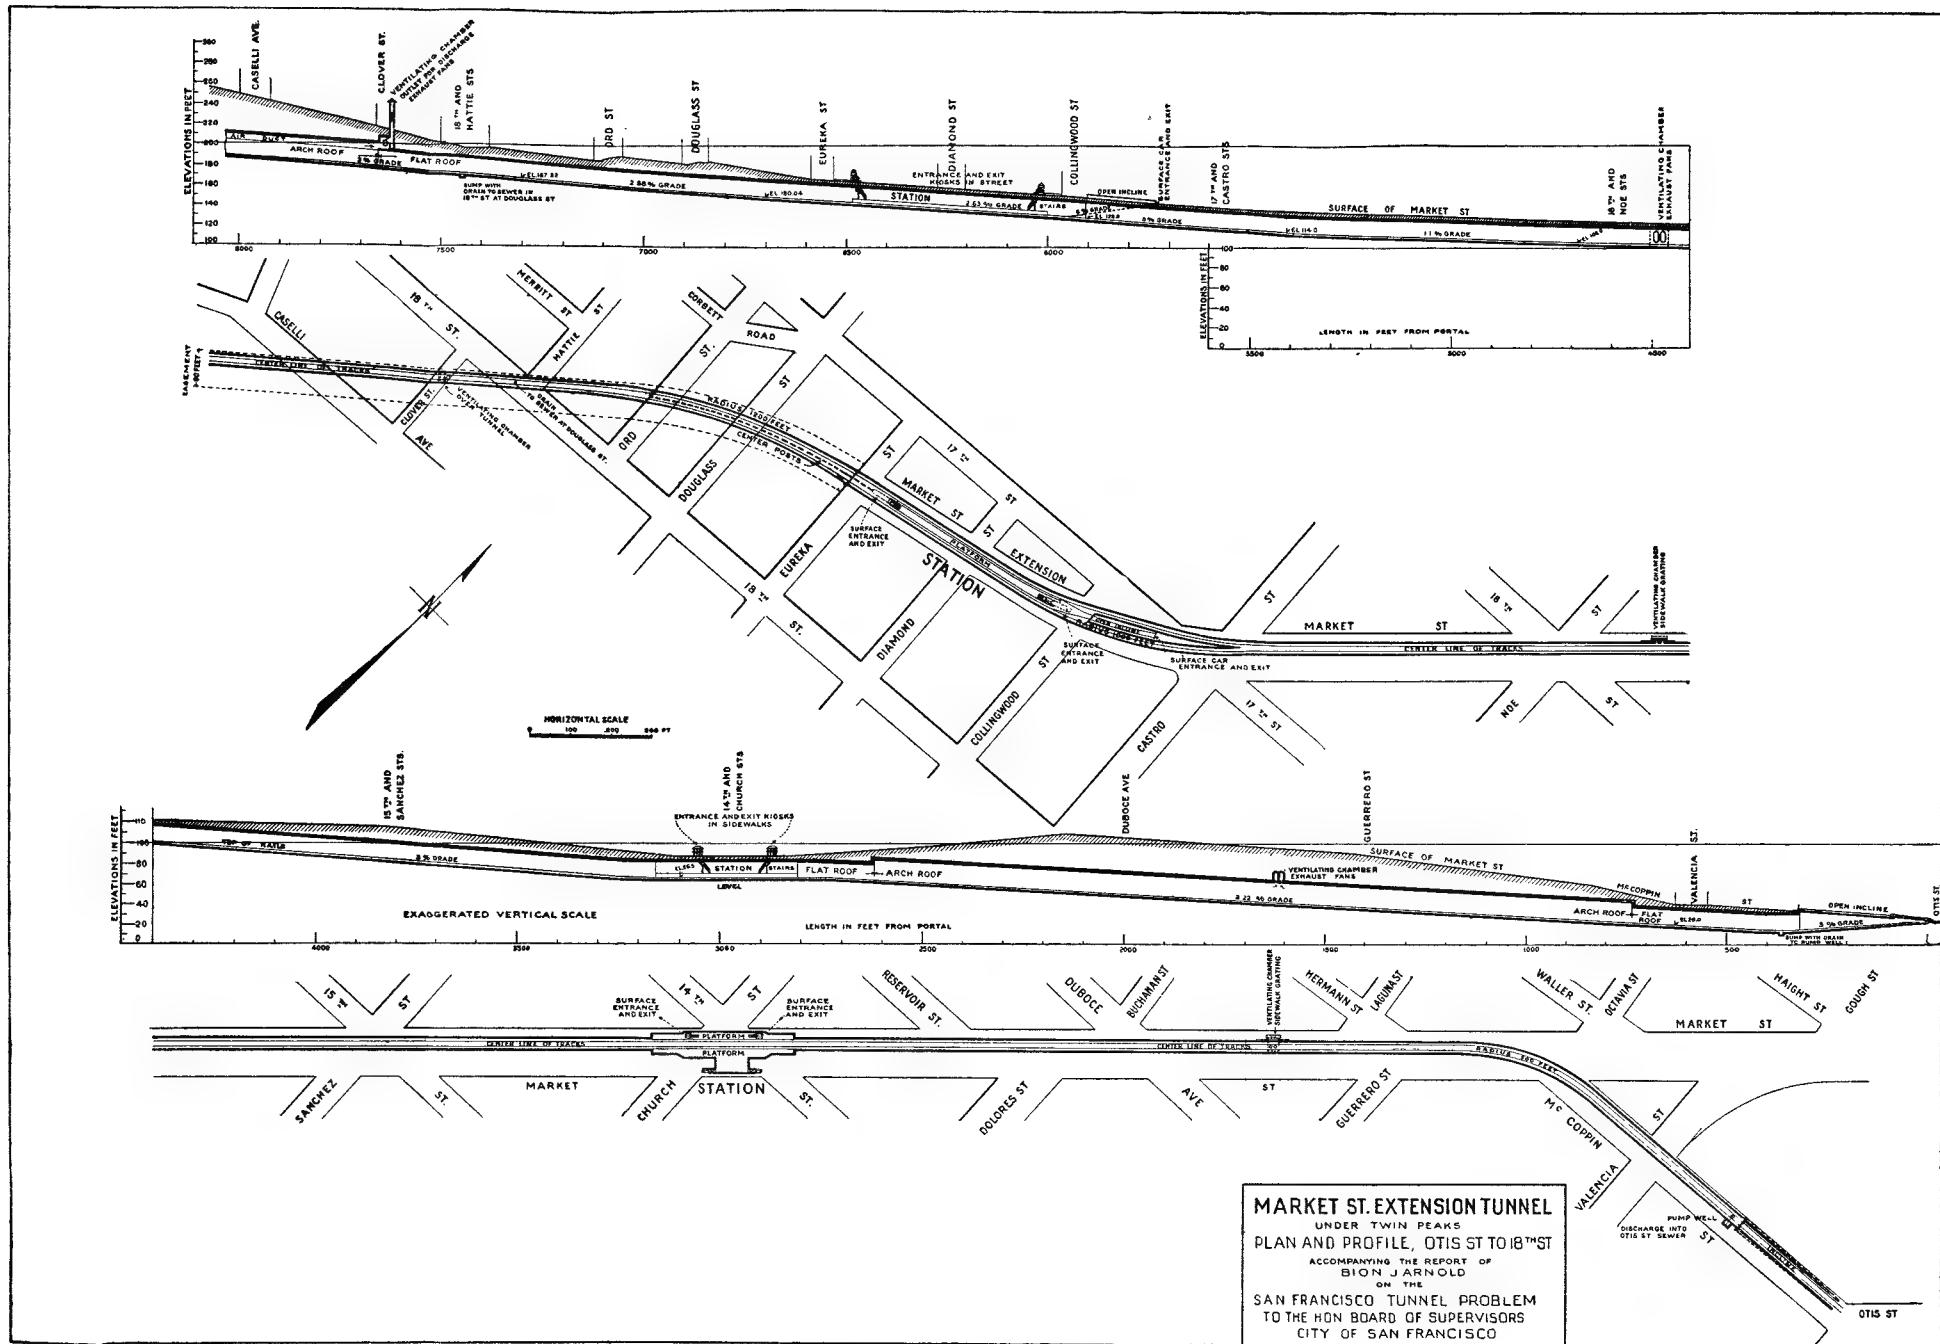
DETAILS OF MARKET STREET EXTENSION TUNNEL UNDER TWIN PEAKS.
